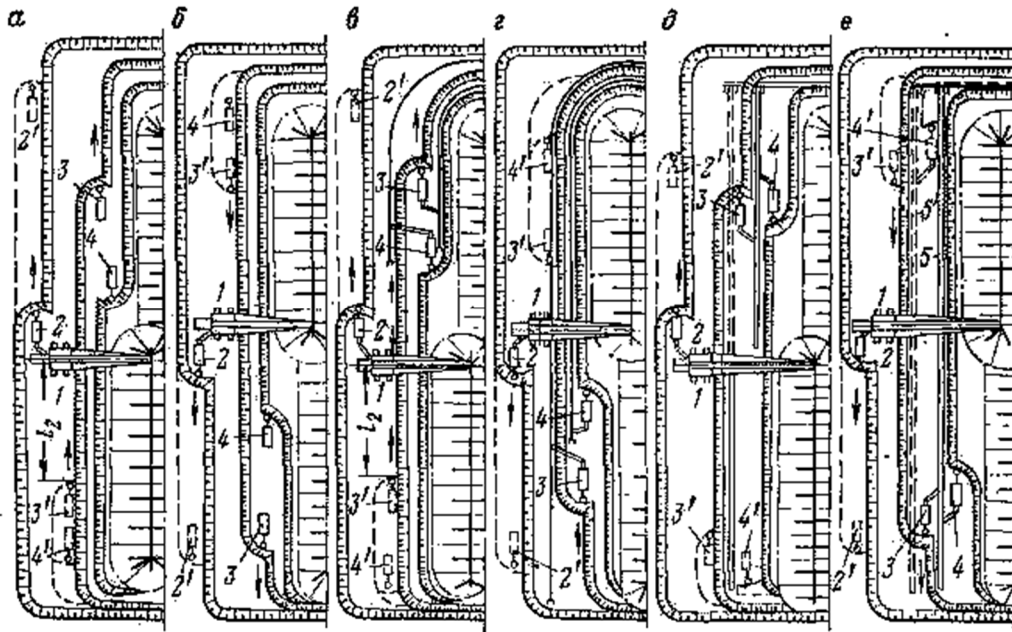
Excavation schemes with the installation of a dumper on the roof of the deposit:
